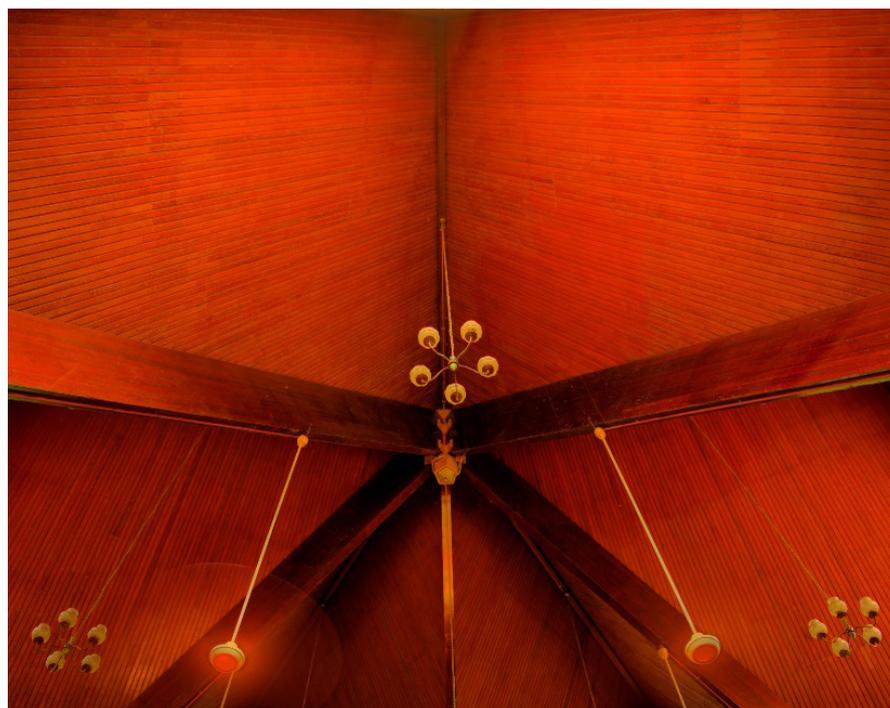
Slanted glued-laminated beams used as load bearing roof components in FRIM's mosque while exposing their beauty
